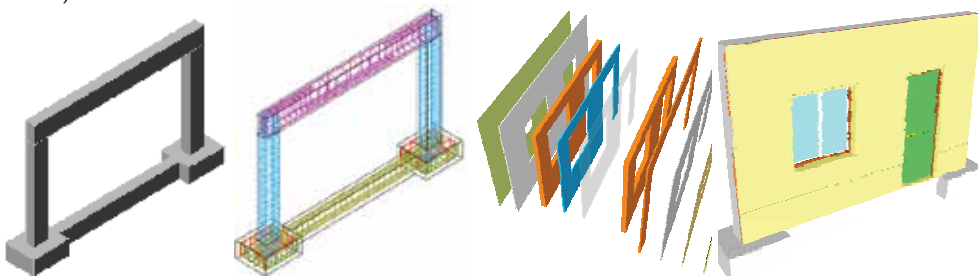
Steel reinforcements 3D models of the structural elements, the vertical filler panels and the door and window openings.
